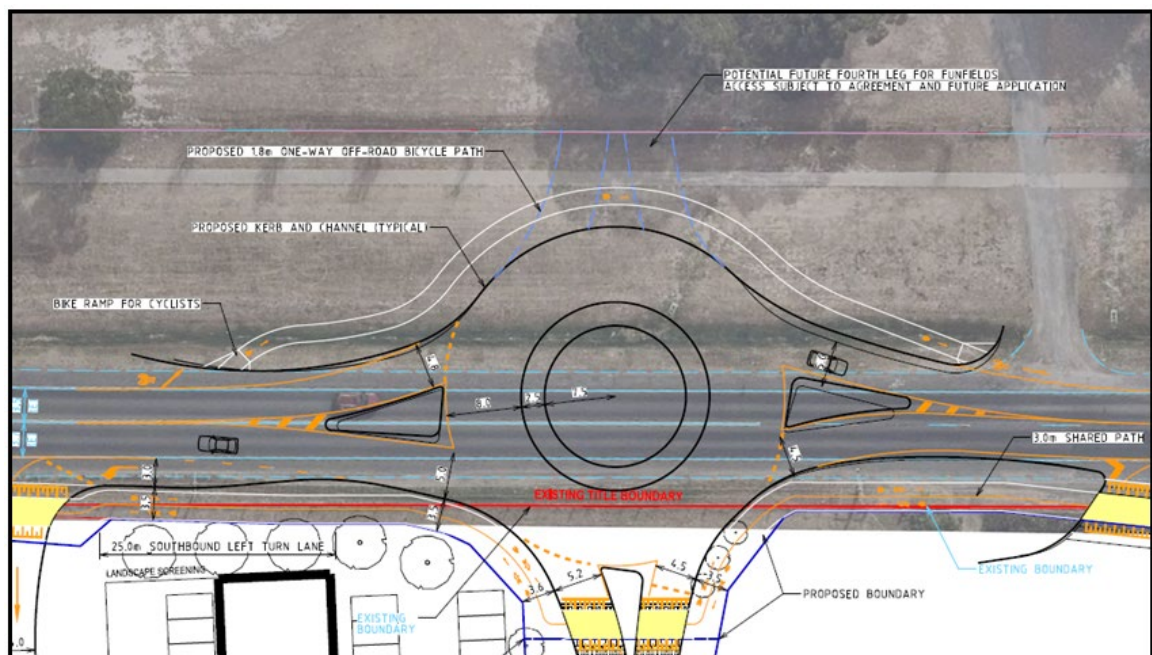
Concept Functional Layout Plan (Source: Traffix Group)
